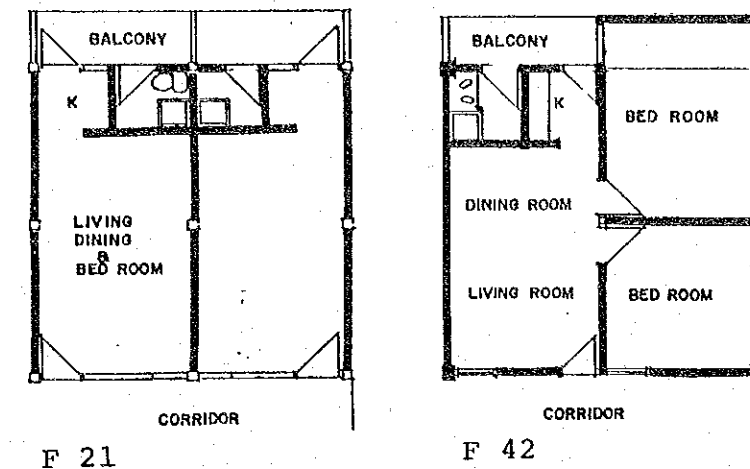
UNIT PLAN USED IN THE MODEL STUDY
